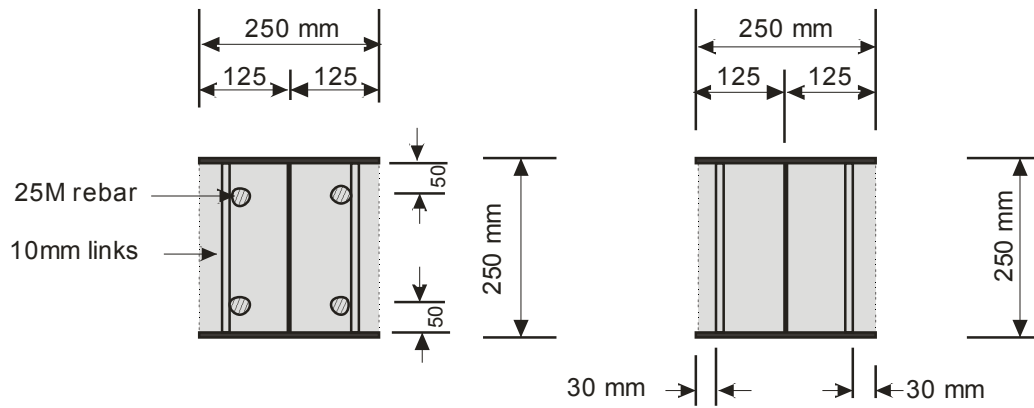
Cross-section of PEC columns with longitudinal rebar at the base (left) and without longitudinal rebar at other levels (right)
